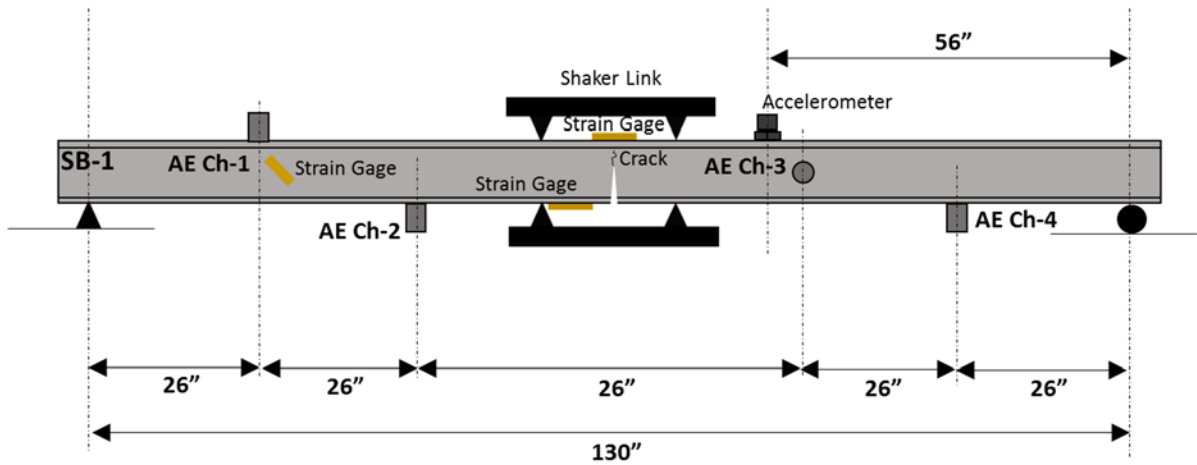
Locations of gages, transducers, accelerometer and crack in beam SB-1.
